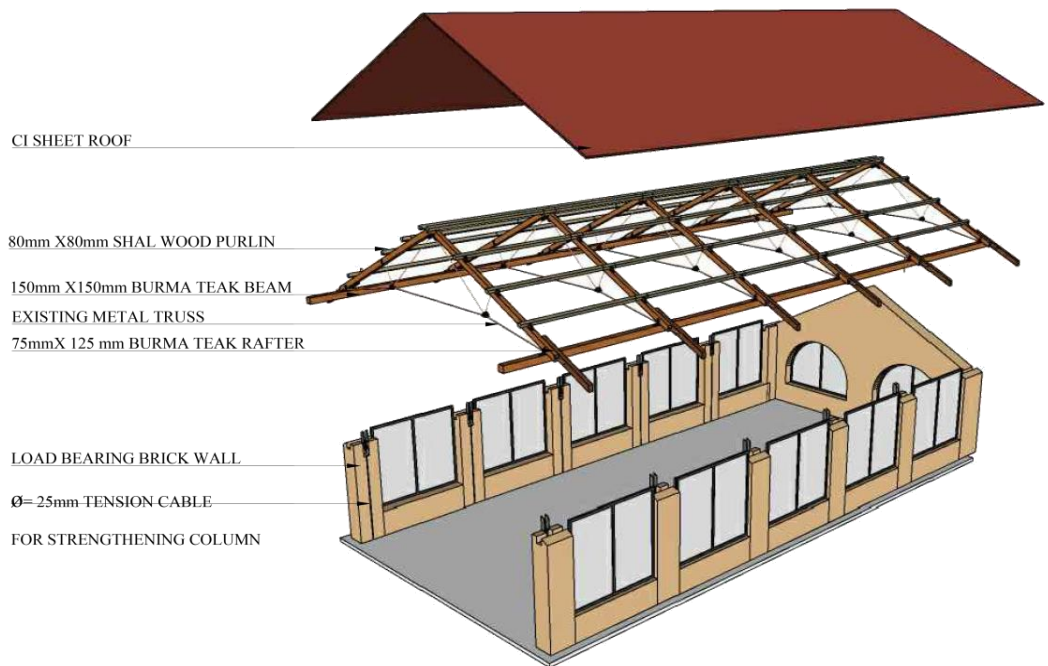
Exploded Axonometric View of Roof Detail for CC-05
